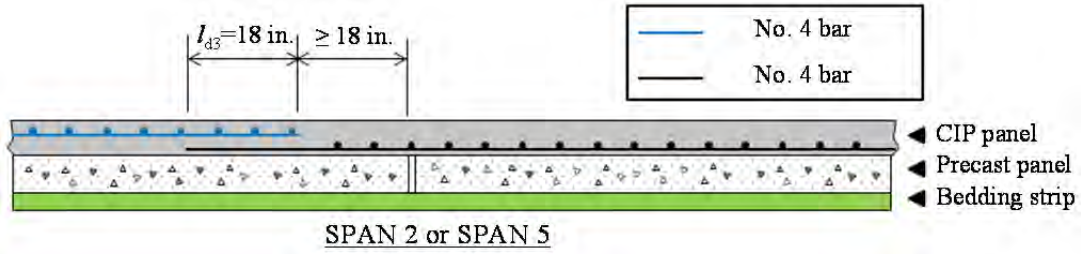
Details of longitudinal splices, Lampasas River Bridge (Sections C-C and I-I)
